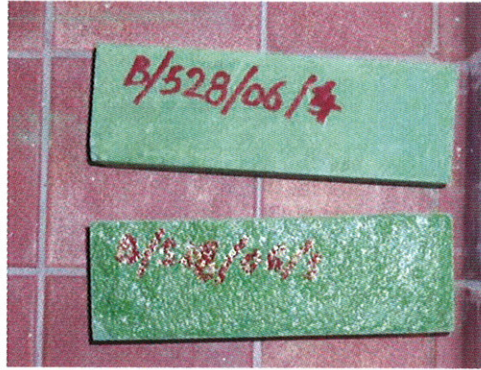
Green fire bricks, Cremators Room and Storage Room
